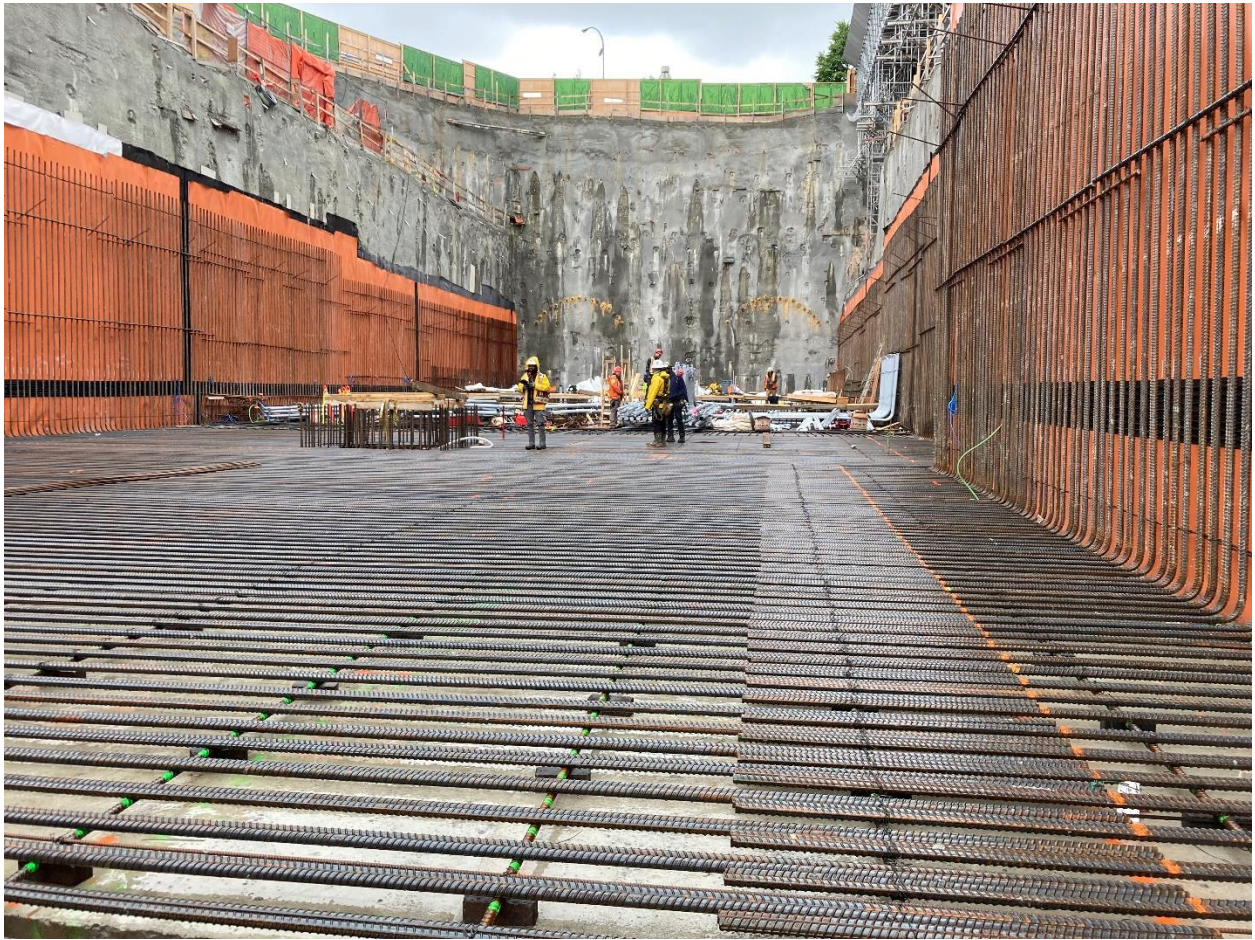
Great Northern Way-Emily Carr Station: Progressing with the installation of waterproof lining and rebar for the station box.
